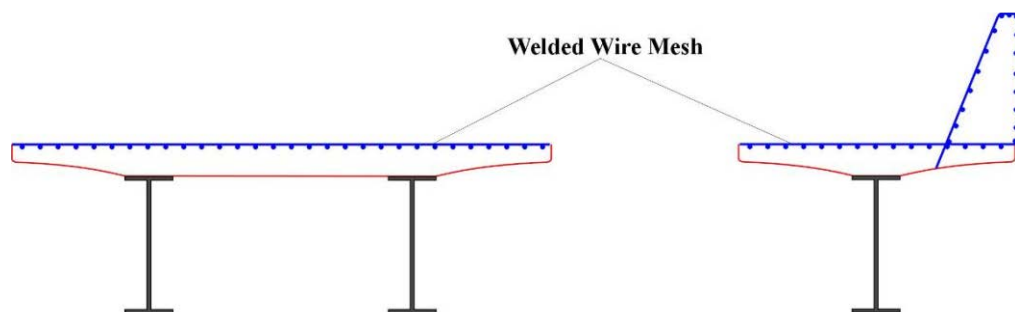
Proposed Cross-Section for a Cast-In-Place Concrete Deck without Formwork (SDR Engineering Consultants 2005)
